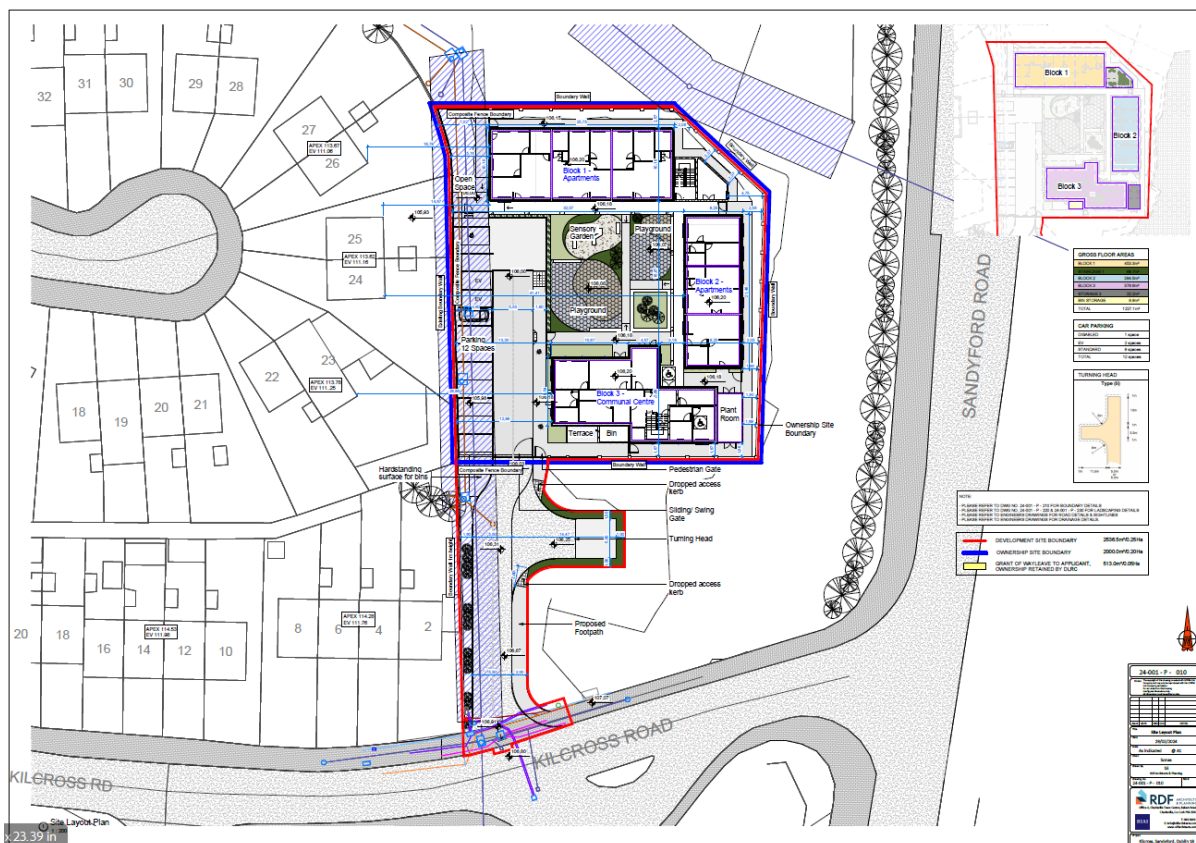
Proposed Development Site Layout (RDF Architects, 2024)
